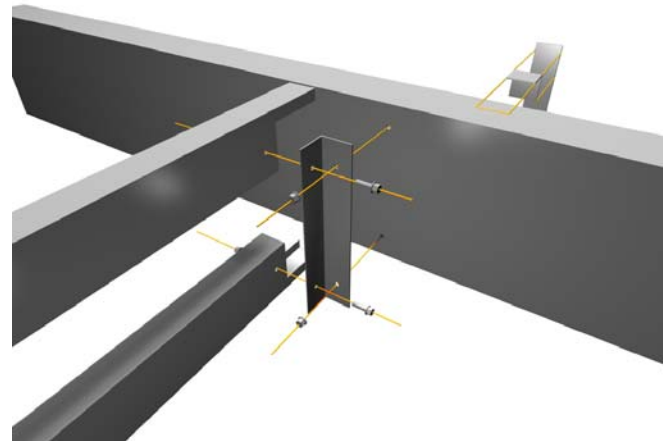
Assembly drawing of lipped channel steel joists connecting to the U-profile steel beams
